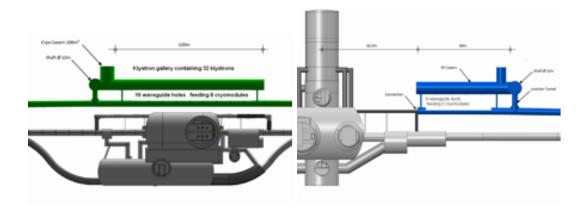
RF tunnel Layouts at CMS and ATLAS bypasses. Note only the right hand side at ATLAS shown.
